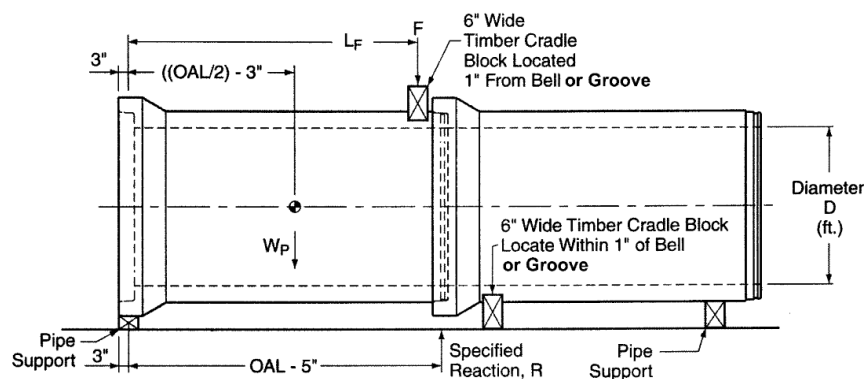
Joint shear test pipe setup (ASTM C497)
